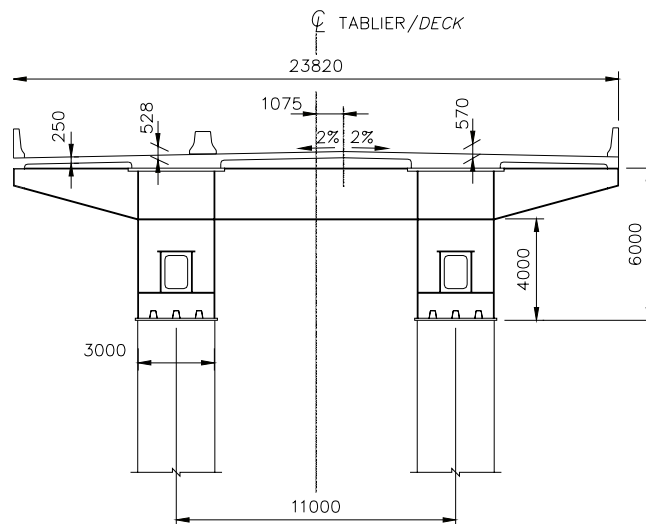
Cross-section– Mixed frame bridge with V-shaped piers – Open single box girder
